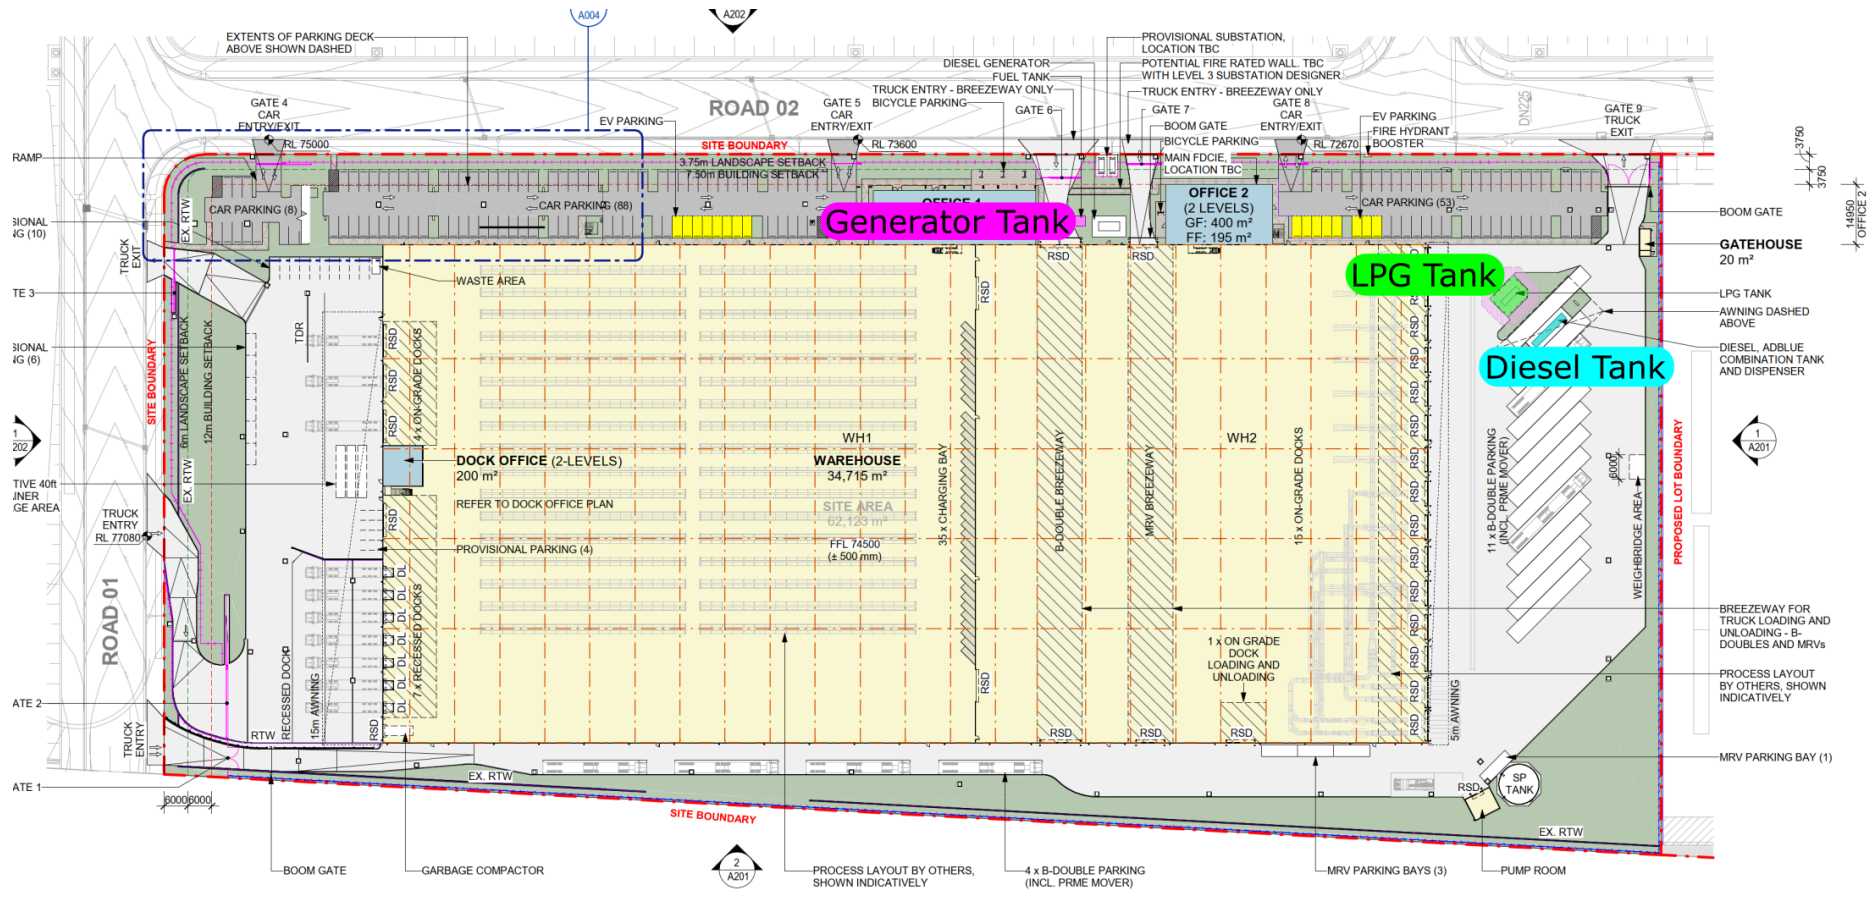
Site Plan of Including Proposed DG Storage and Use Locations
